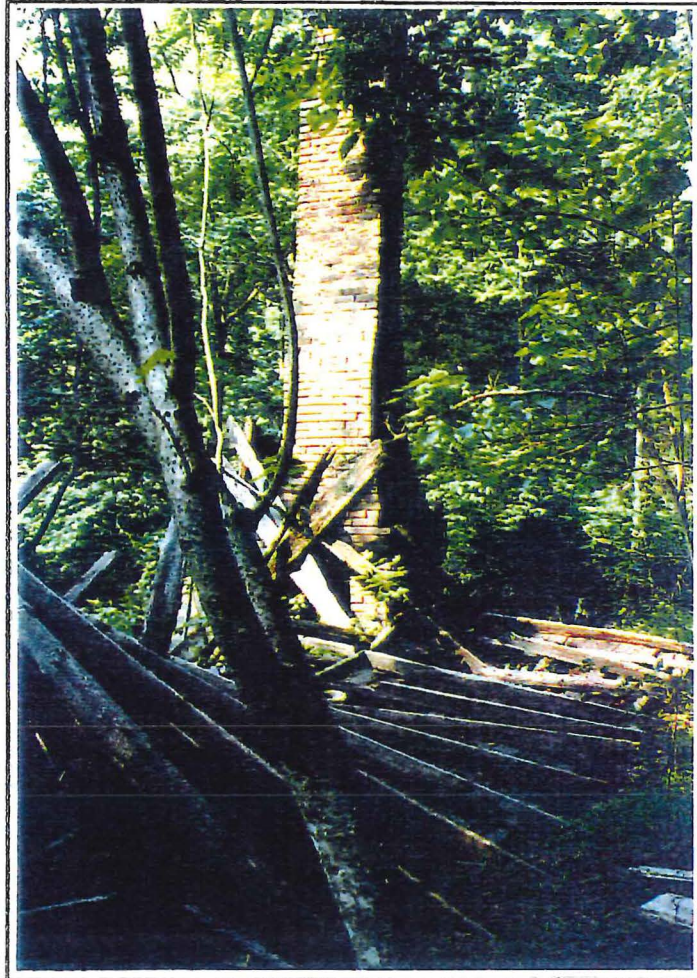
611A - View looking southwest at chimney and collapsed framing.
